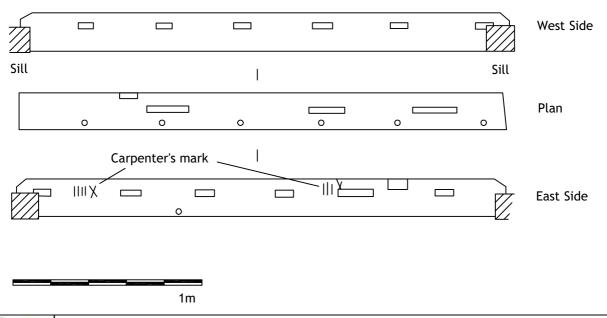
Apethorpe Hall, Northamptonshire Selected examples of reused timbers found in the east part of the East Range roof 1:20 at A4 RS/DW 19/07/07
